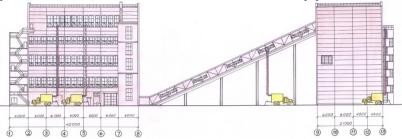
Location of the mobile dust collector while assembling the vertical section of pipelines
